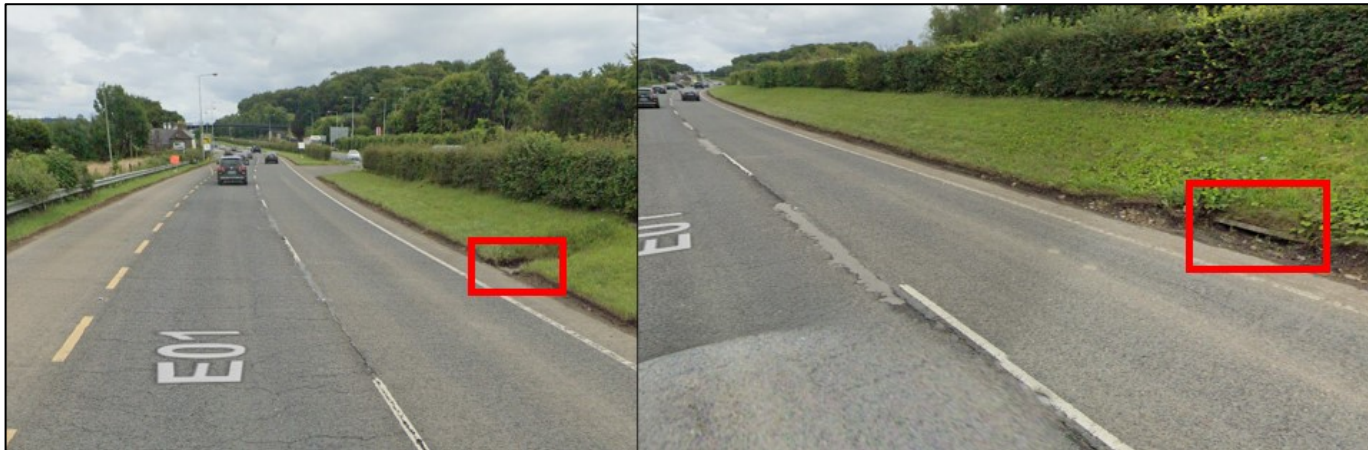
N11 Mainline Approach to L5046 Johnstown Entrance Drainage system
